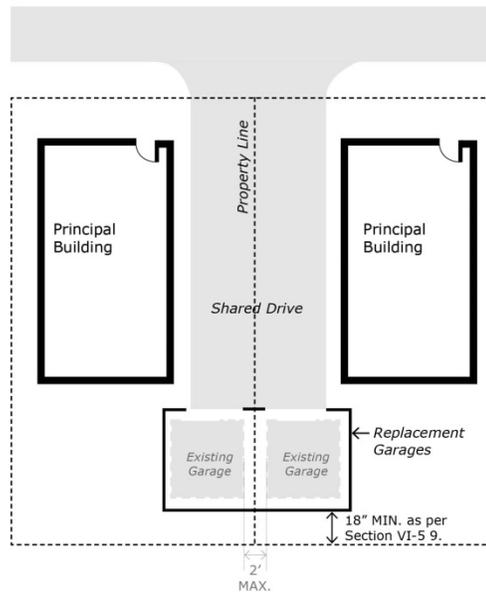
EXHIBIT B: Zoning Ordinance Section VI-5.B Proposed Illustrations
